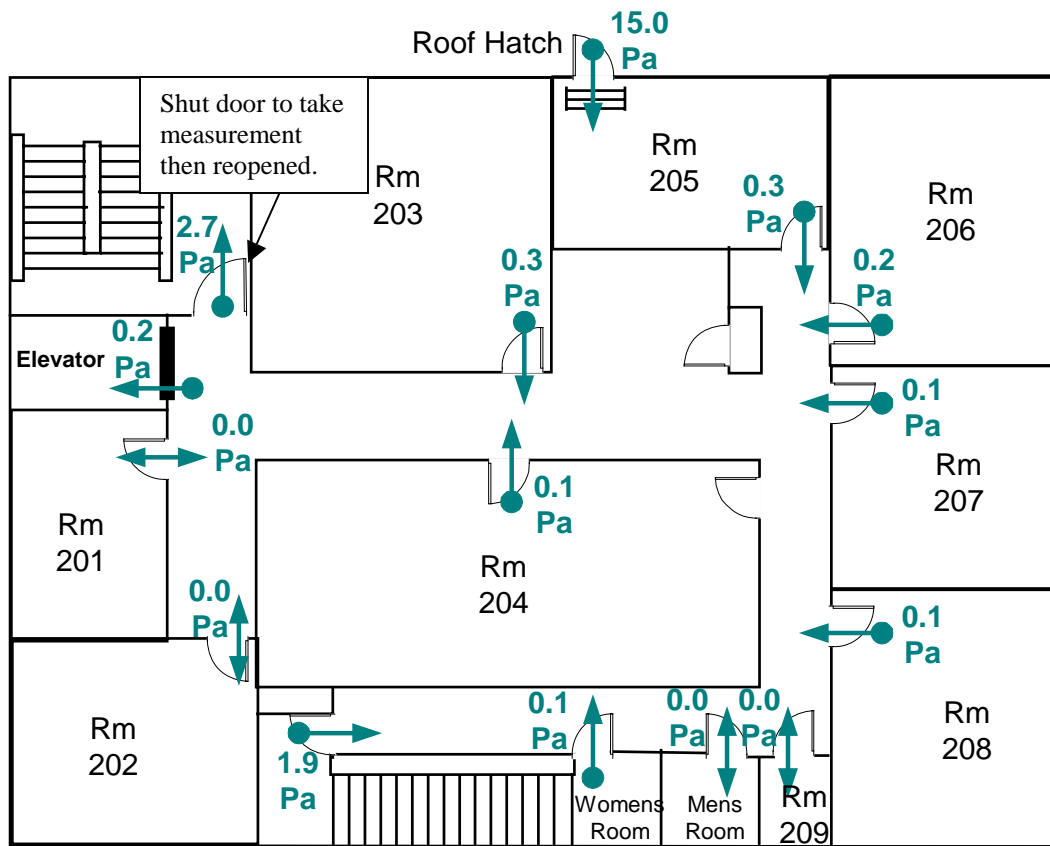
Second Floor Room-to-Corridor Pressures with Building Depressurized to 20 Pa
